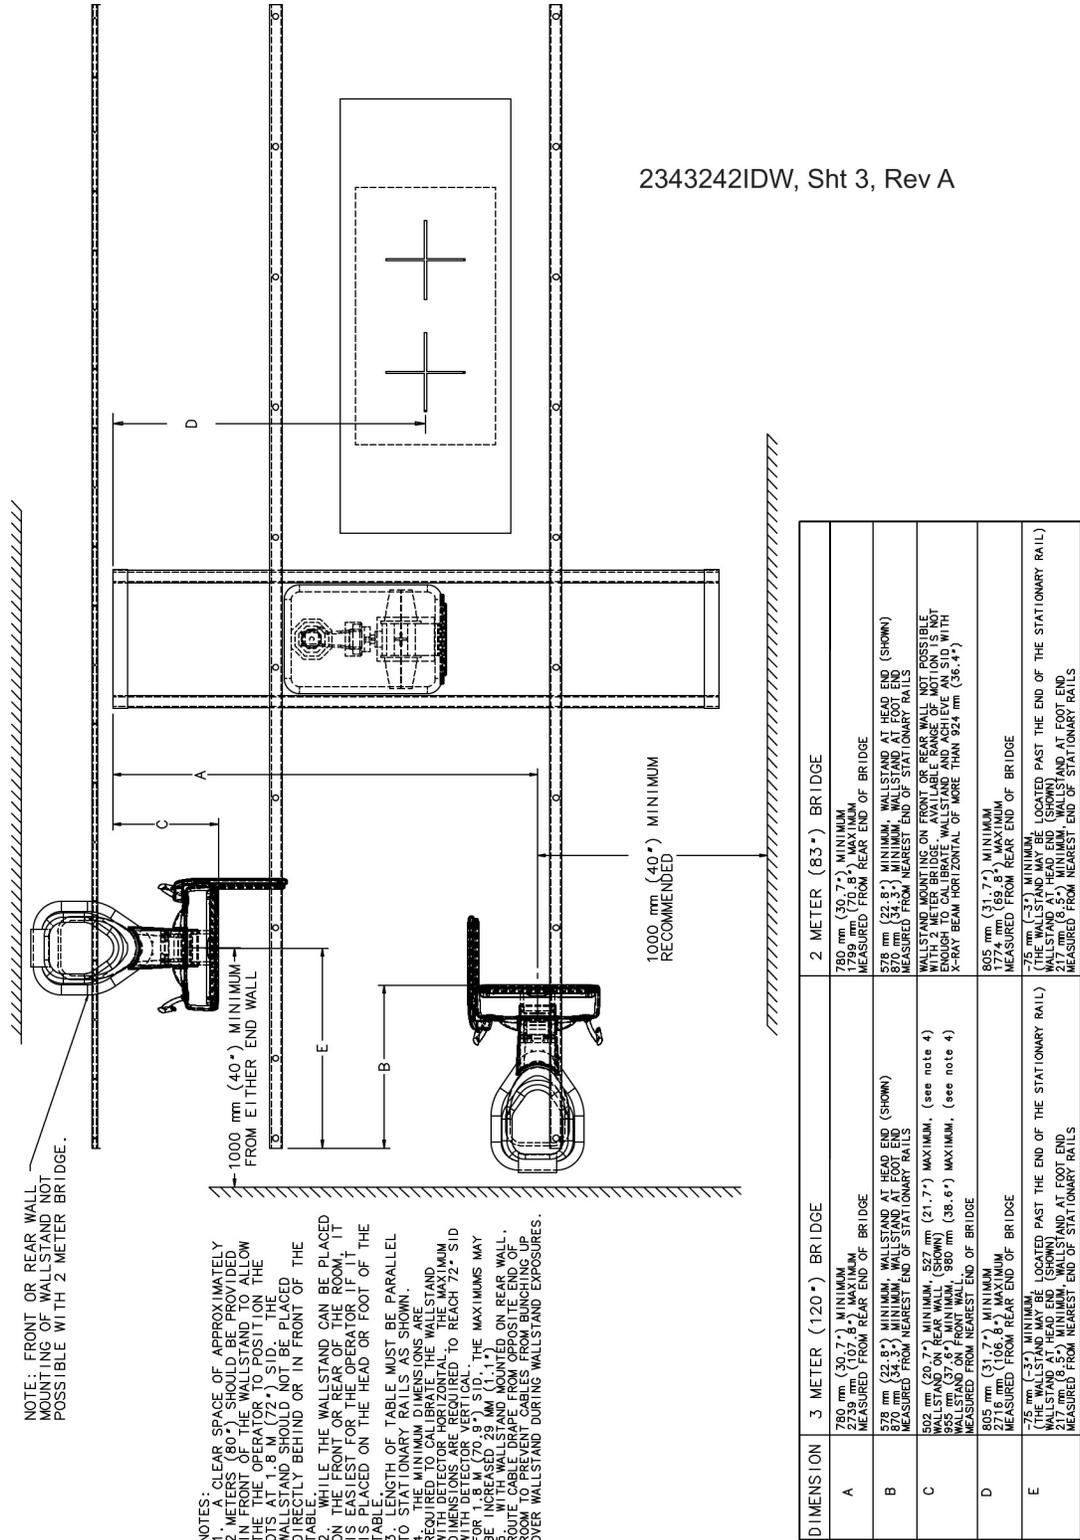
OTS Bridge View for Wall Stand, All Dimensions Minimum Values
